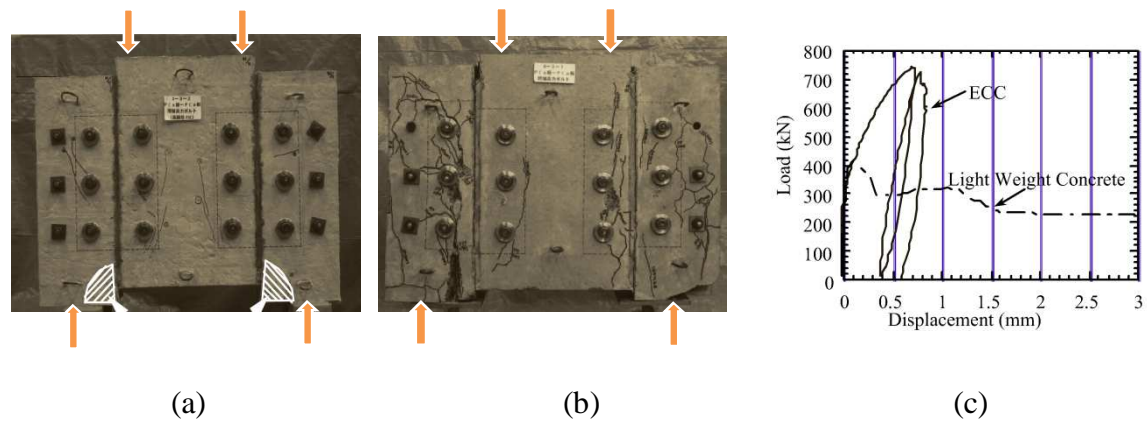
Dry joint test configuration and results [44], (a) specimen made of ECC panels failed by crushing at supporting regions while almost no damage was observed at the joint region, (b) specimens made of light weight concrete failed with splitting cracks along the holes, (c) load-displacement response of shear test on ECC and lightweight dry joint specimens.
